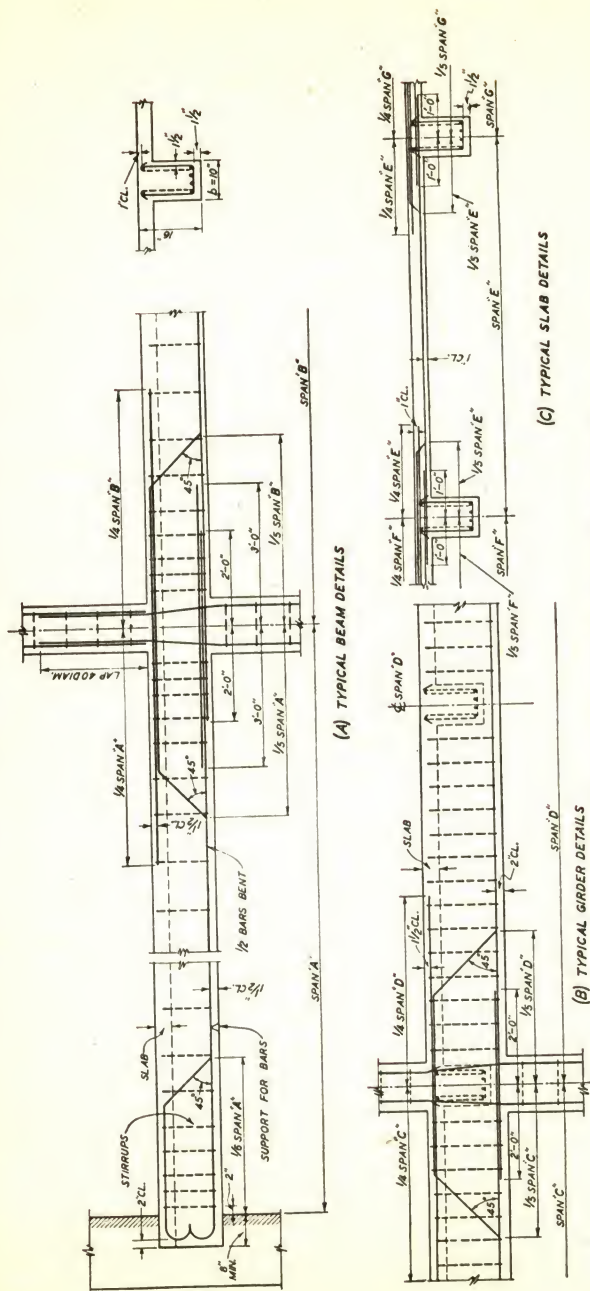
Reinforcing Details for Slab, Beam, and Girder
